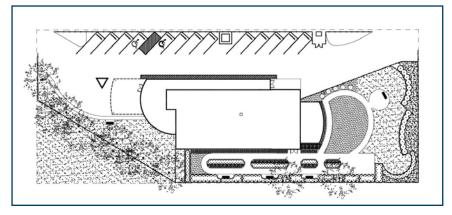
Sample landscape plan with pathways and turning areas Diagram by Ron Wickman, Architect
